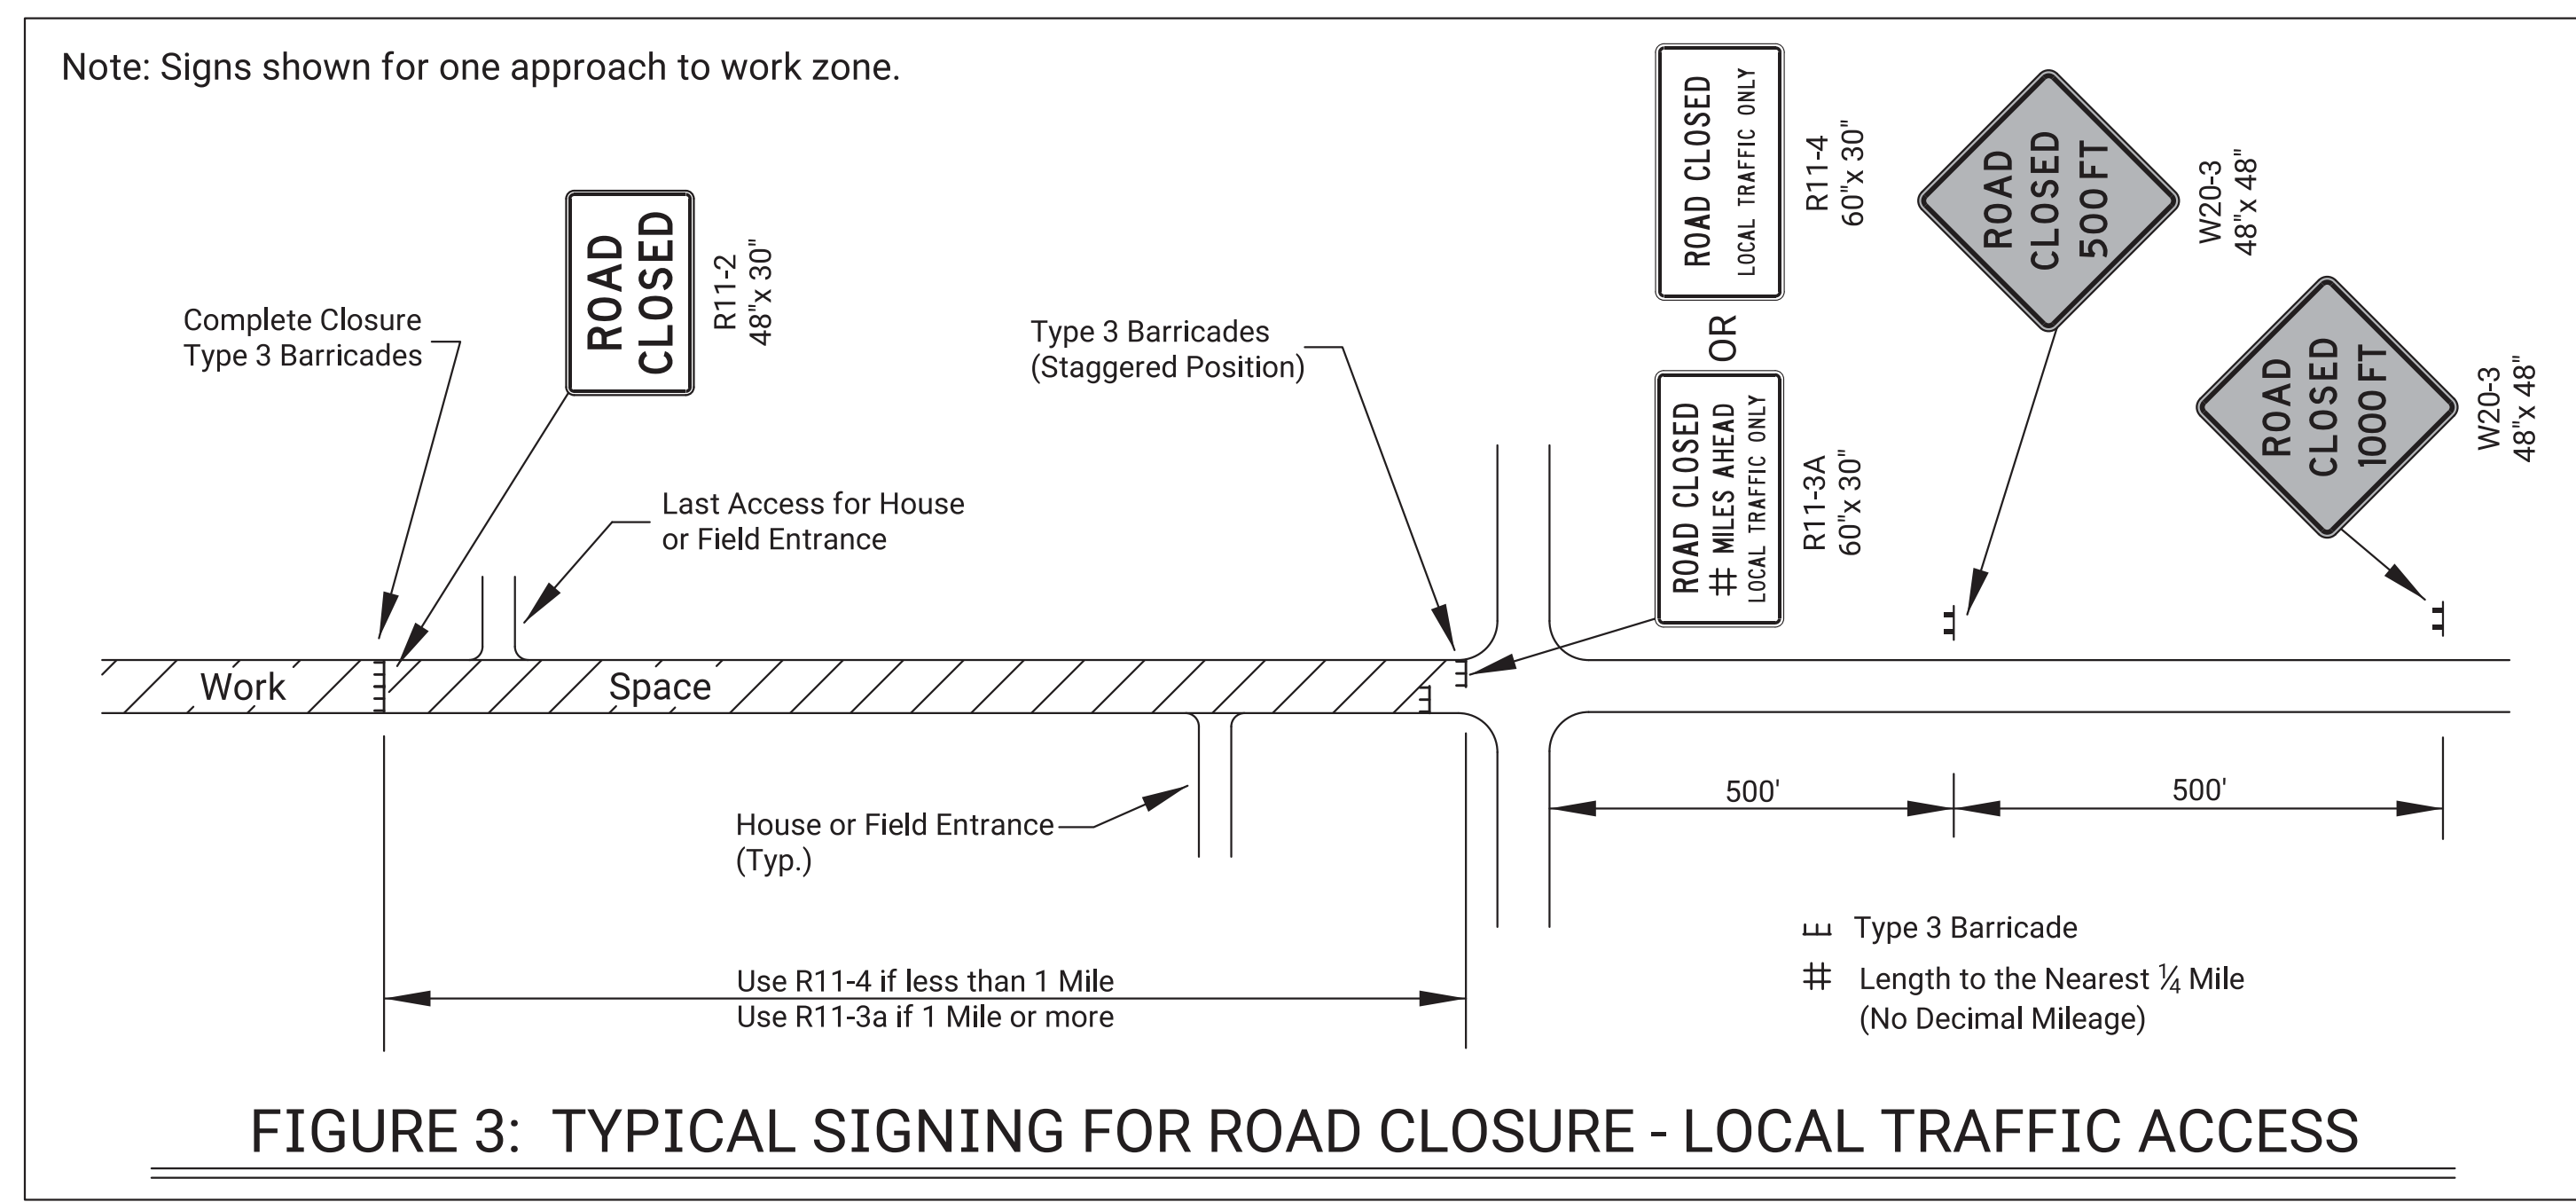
TYPICAL SIGNING FOR ROAD CLOSURE - LOCAL TRAFFIC ACCESS
